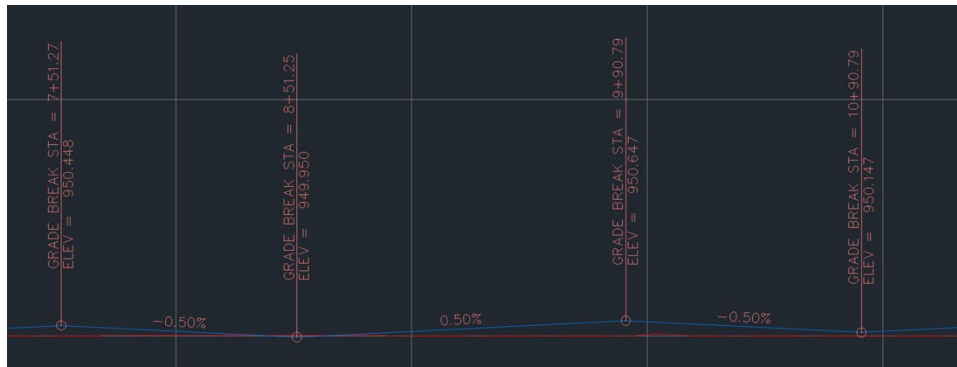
Stair step design on Grand Avenue from Civil 3D.
